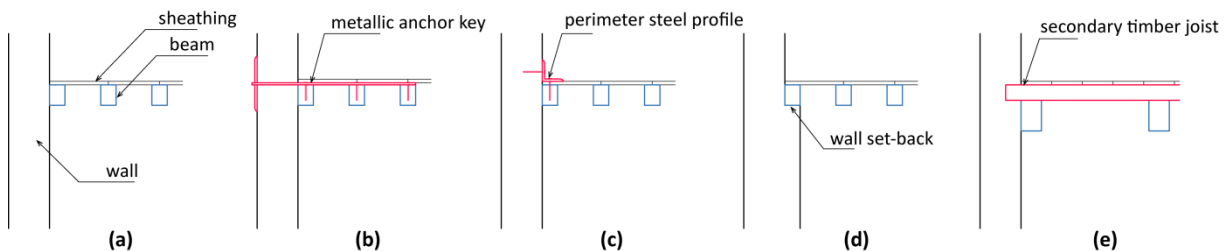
(a) Typical lack of connection between the beams and the parallel walls; (b) metallic anchor keys anchoring the beams to the wall; (c) use of perimeter steel profiles; (d) beams resting on the set-back of the wall; and (e) secondary timber joists partially embedded within the wall
